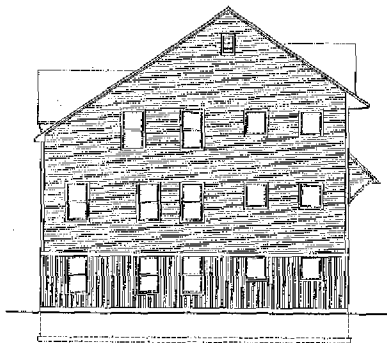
Exhibit D-Proposed Elevations for Buildings A,B,C,D and F
